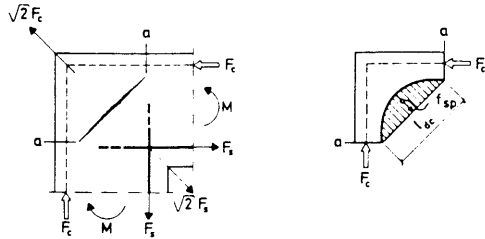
Truss Idealization of Corner Subjected to Positive Moment
